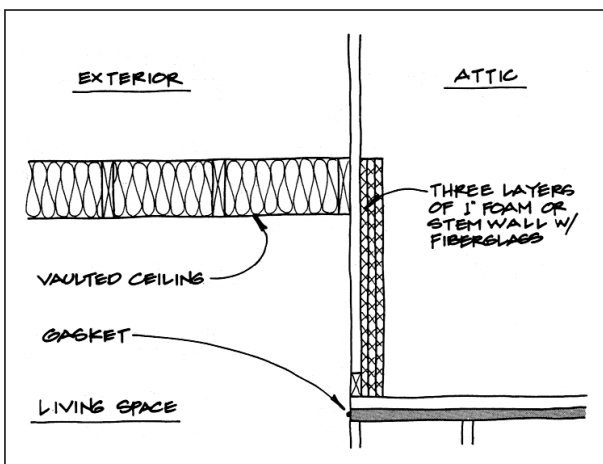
Where a cathedral ceiling meets a wall backed by attic space, the wall should be insulated to the same R-value as the exterior walls. Foam sheathing usually provides the easiest solution.
